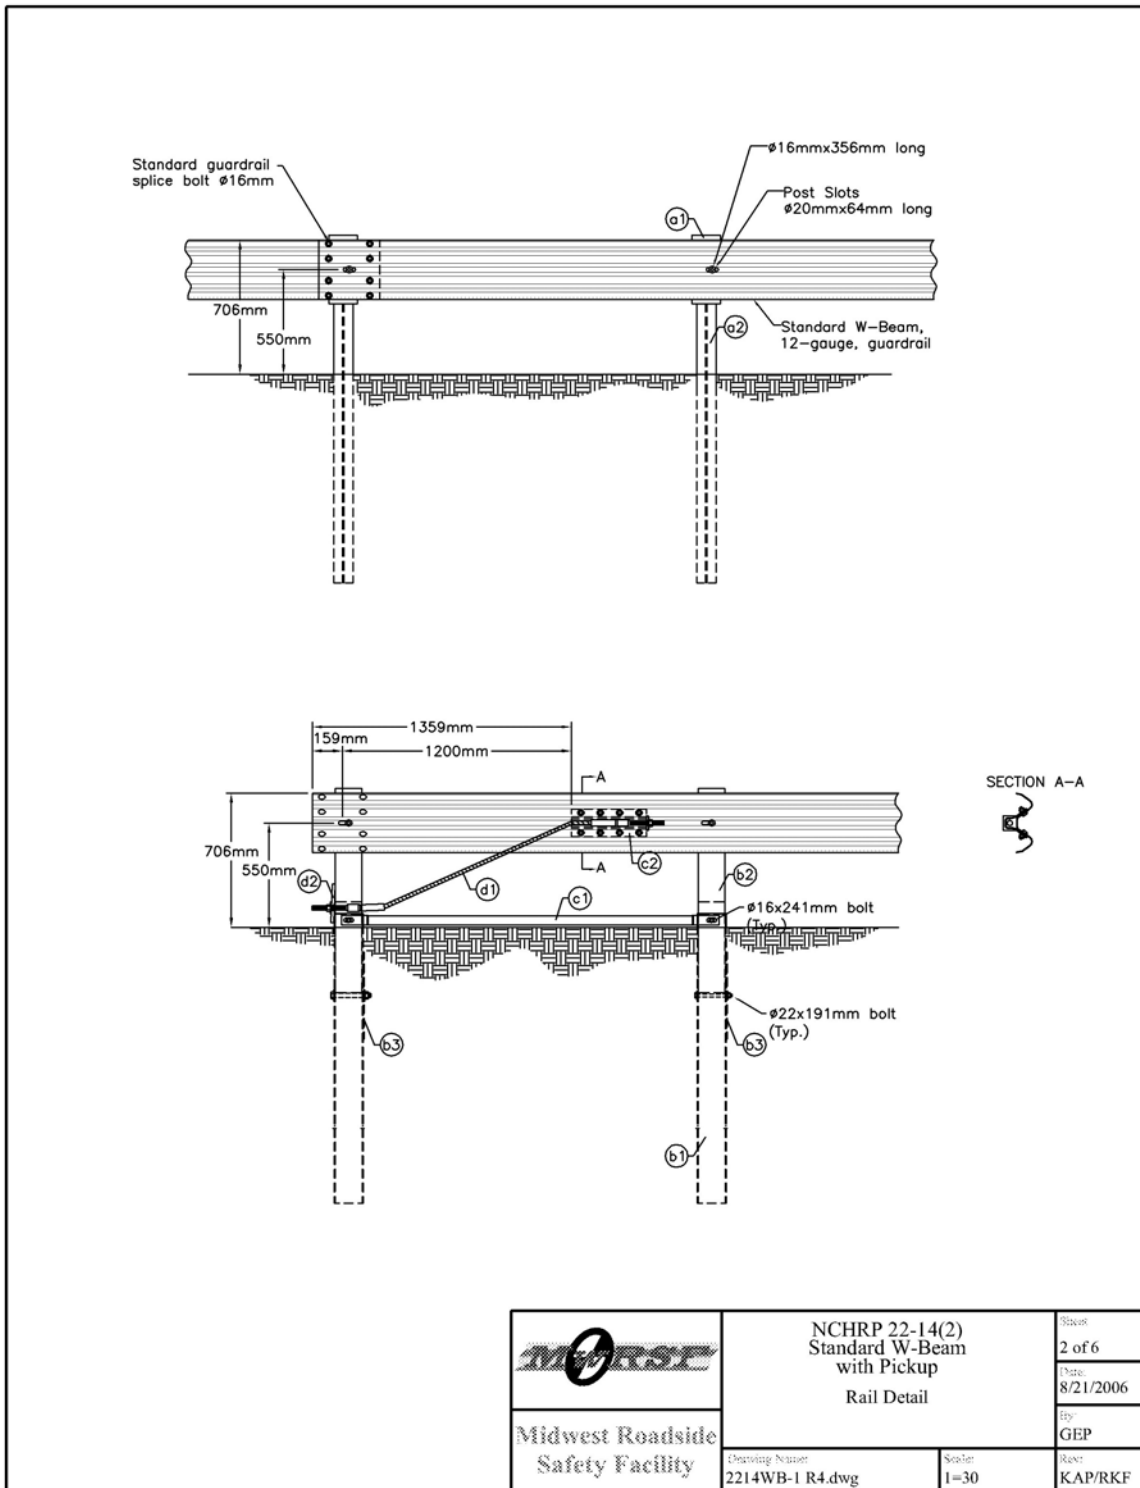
Standard Height, Strong Post, Wood Blockout W-Beam Guardrail Rail Details
